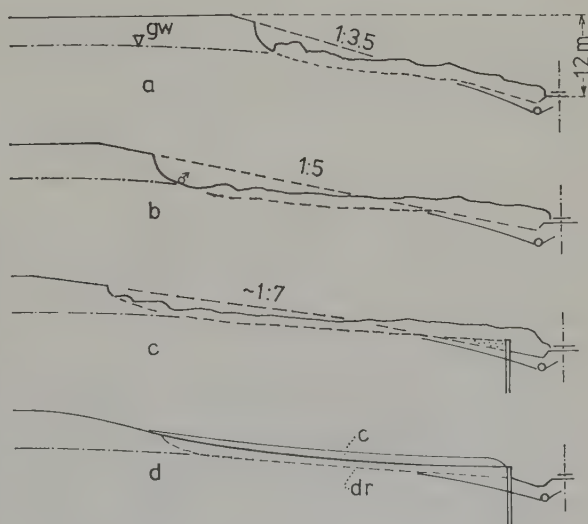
Four stages of the development of excavations of a railway cutting near Česká Třebová, eastern Bohemia; (a) original excavation and failure of the slope, (b) first reconstruction and second failure, (c) second reconstruction using a pile wall and third failure, (d) final state; gw — ground-water table, dr — gravel-filled drain trenches 8 m apart, c — clay cover of trenches.
